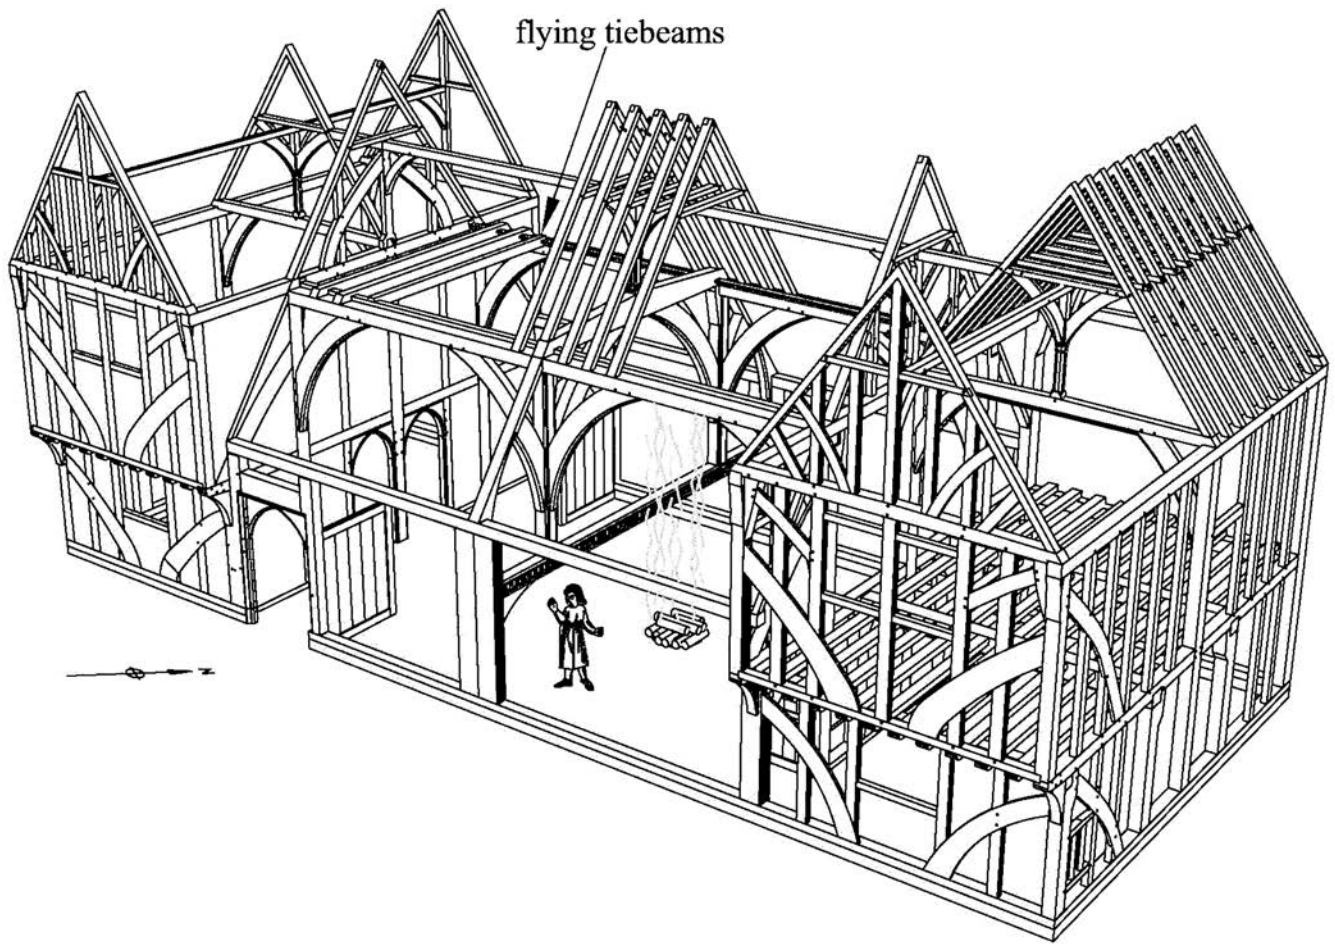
Reconstruction of Baythorne Hall, viewed from south-east
